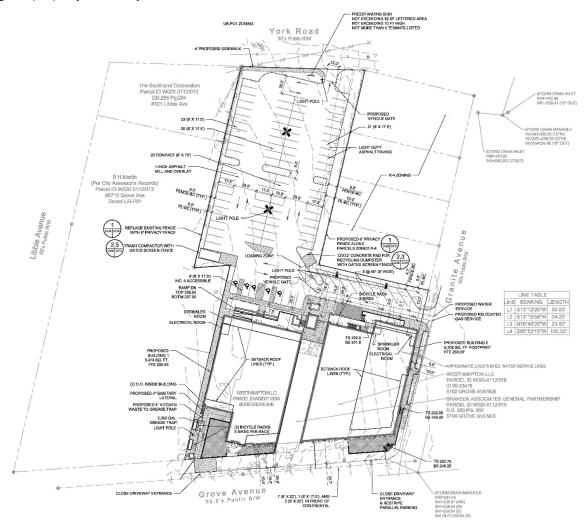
Proposed Plan View (Source: Stewart/HG, May 2016)
